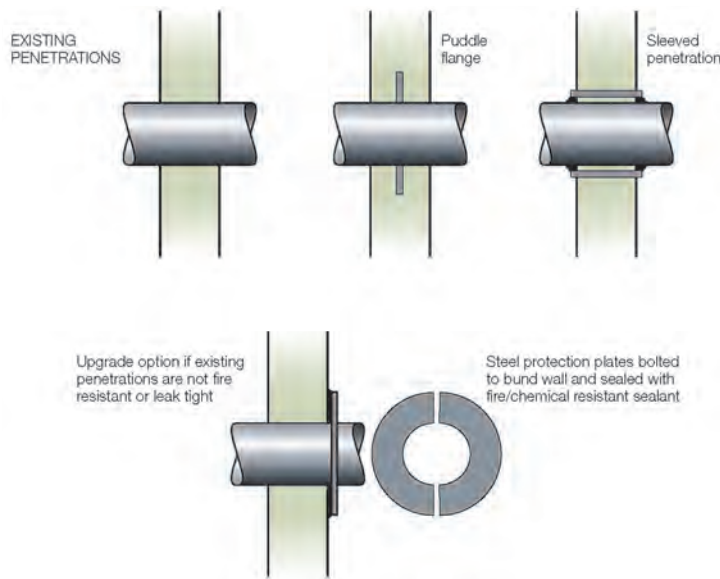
Steel split fire protection plate (from HSE, 2009a)
